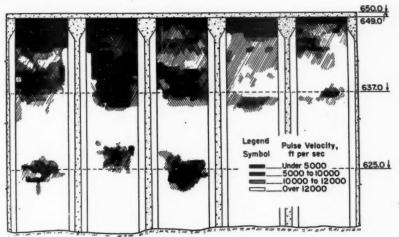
Outline of Deterioration in Slabs of a Reinforced Concrete Dam.
